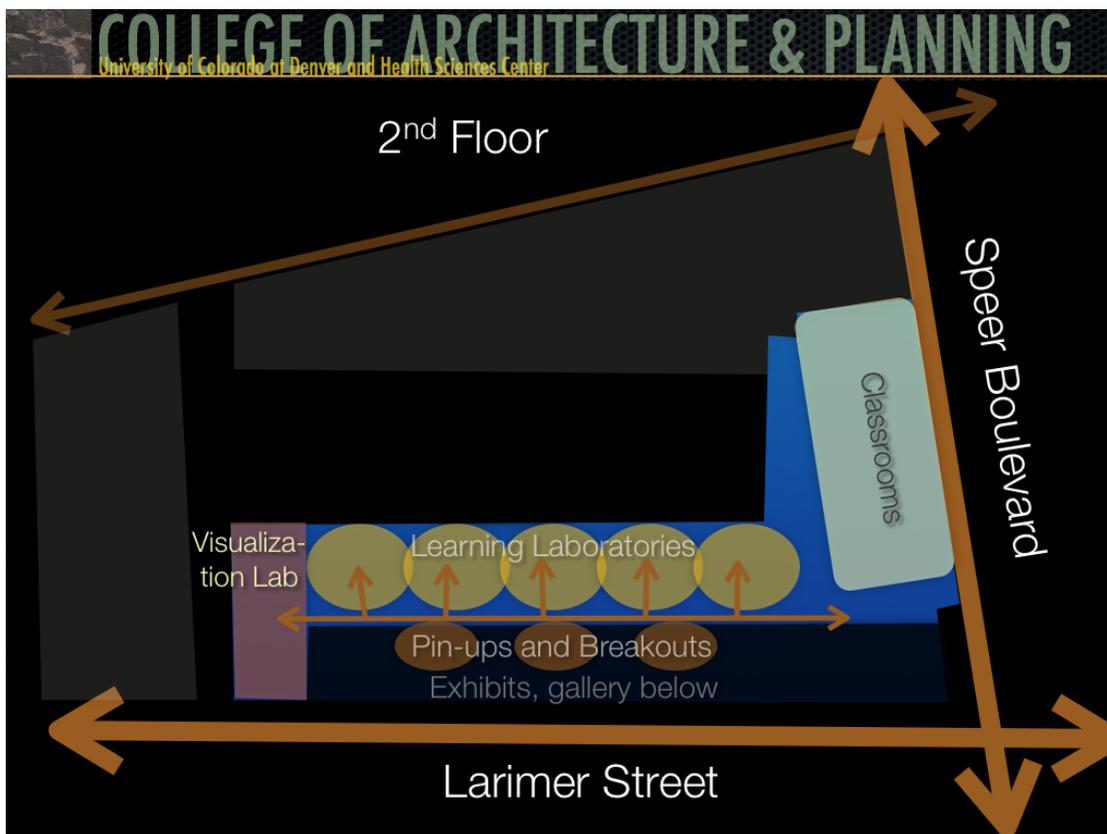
B: Adjacencies Diagrams by Floor –Second Floor
